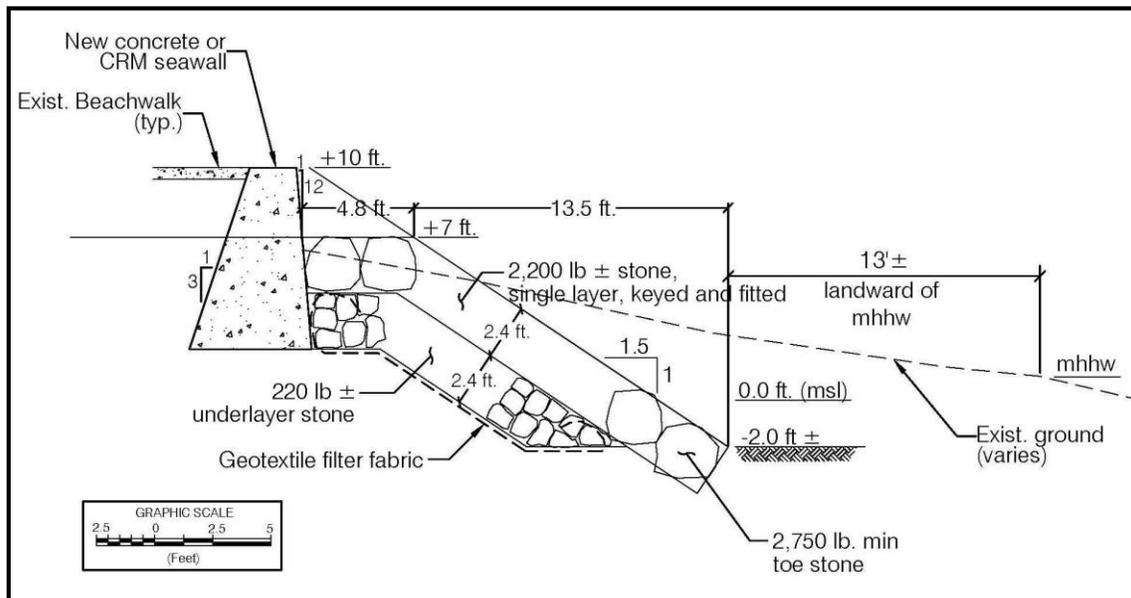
Hybrid seawall / rock rubblemound revetment cross section
